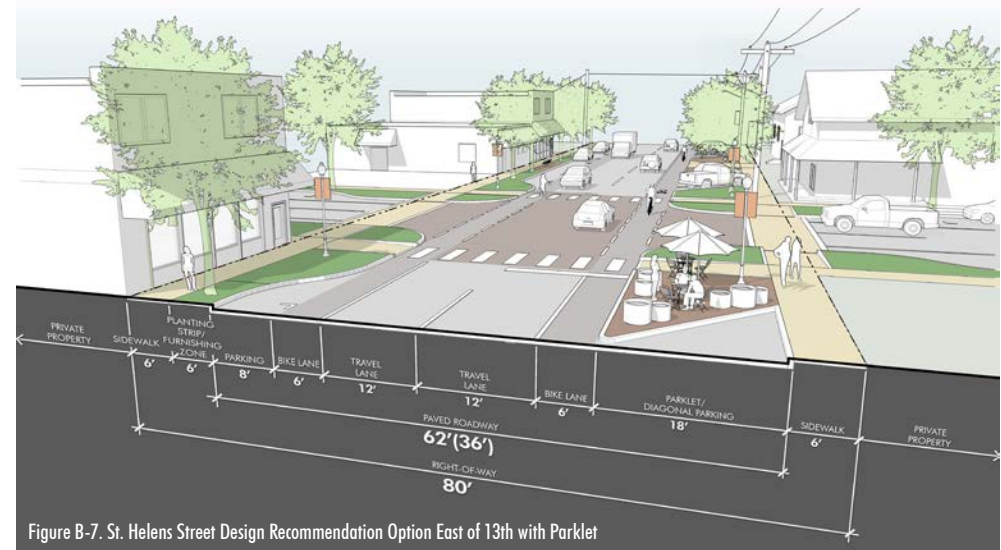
St. Helens Street Design Recommendation Option East of 13th with Parklet
